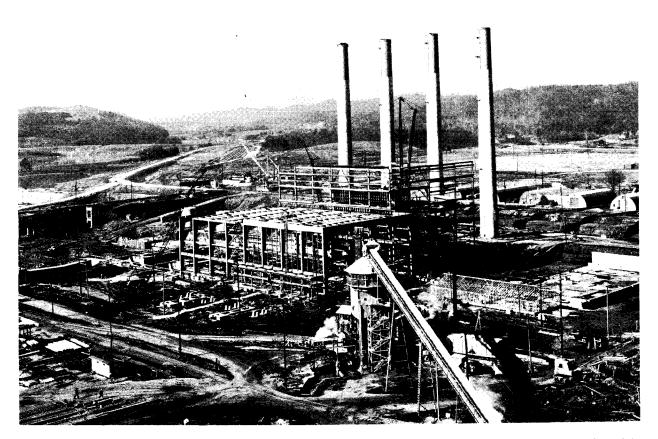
Construction progress as of February 18, 1953, from top of water tower; stacks of units 1 to 4 from right to left. Central concrete mixing plant is in foreground, and service bay and office wing under construction at right.
